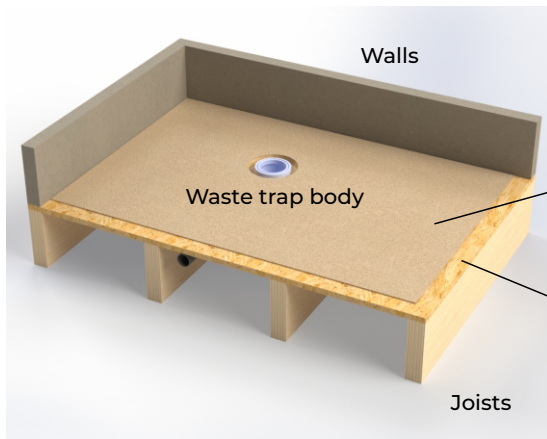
Detailing waste gully and pipe location to suit shower tray outlet.
